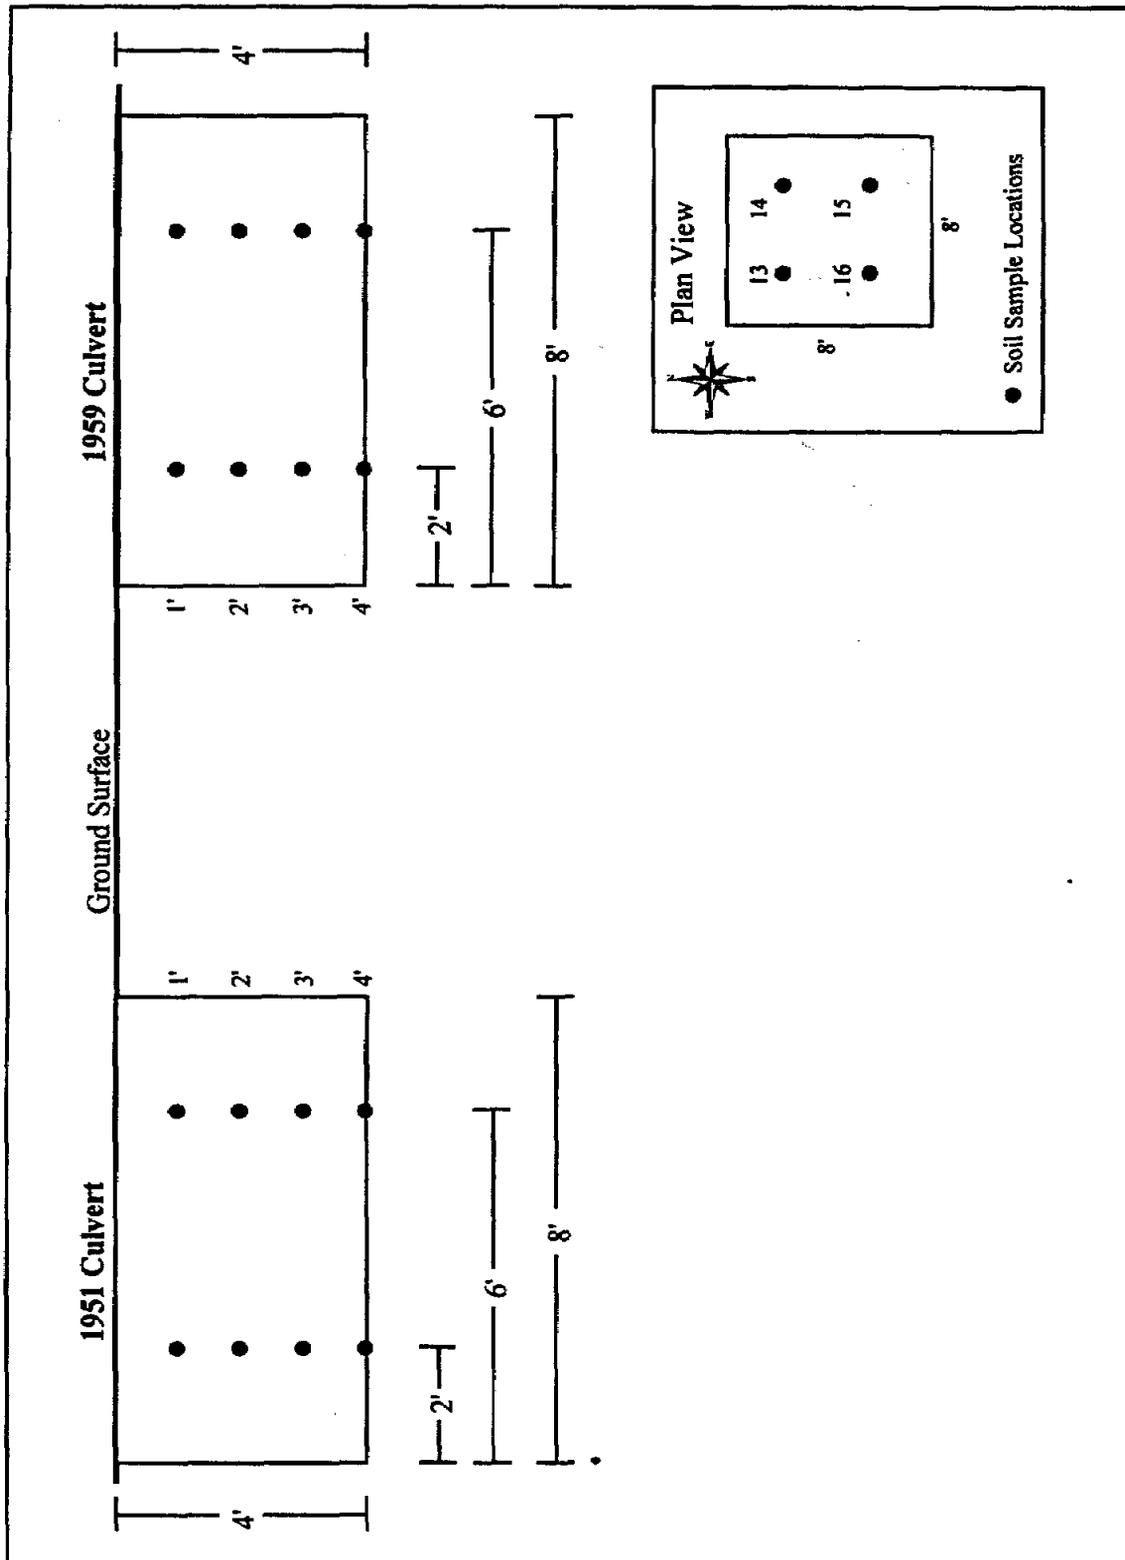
Vertical extent of March 1, 1996 VCM excavation.
